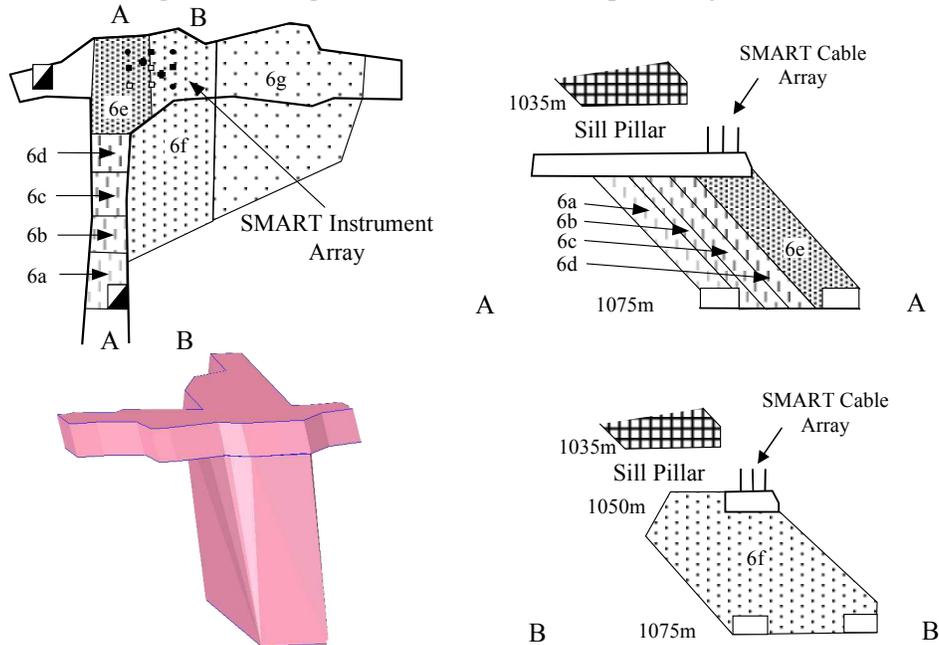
5: Views showing the sequence of mining (6a-g) within the test stope. Clockwise: Plan, cross-sections, and perspective view of the test stope at the completion of the 6f excavation zone.
